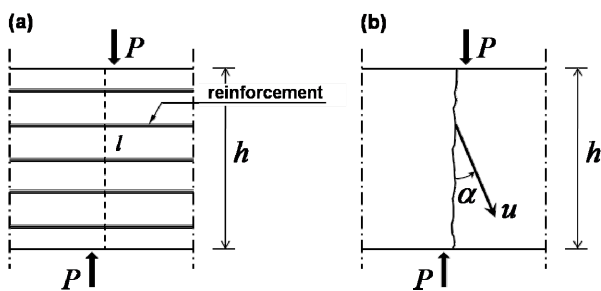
Force set of initially cracked specimen; (a) Specimen subjected to shear, (b) Failure mechanism in specimen subjected to shear
